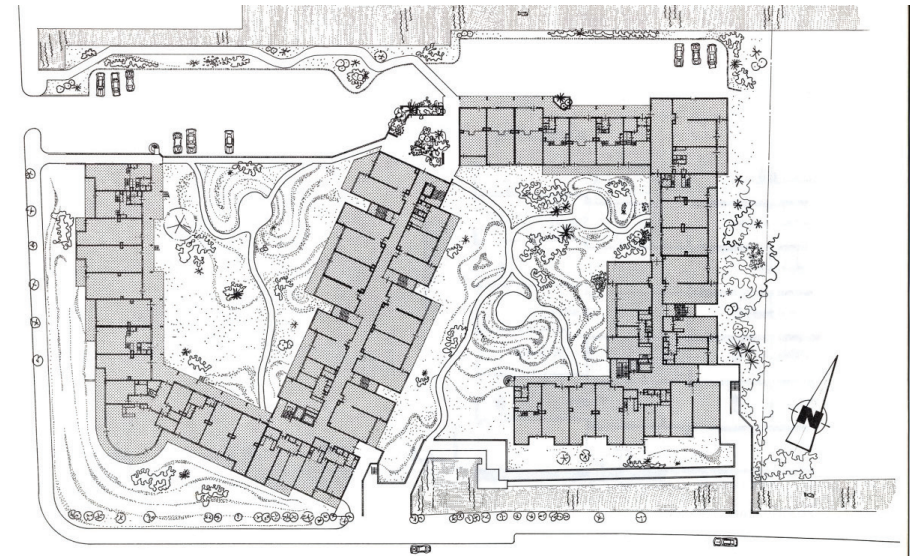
The ground floor plan illustrating courtyards and the landscape
